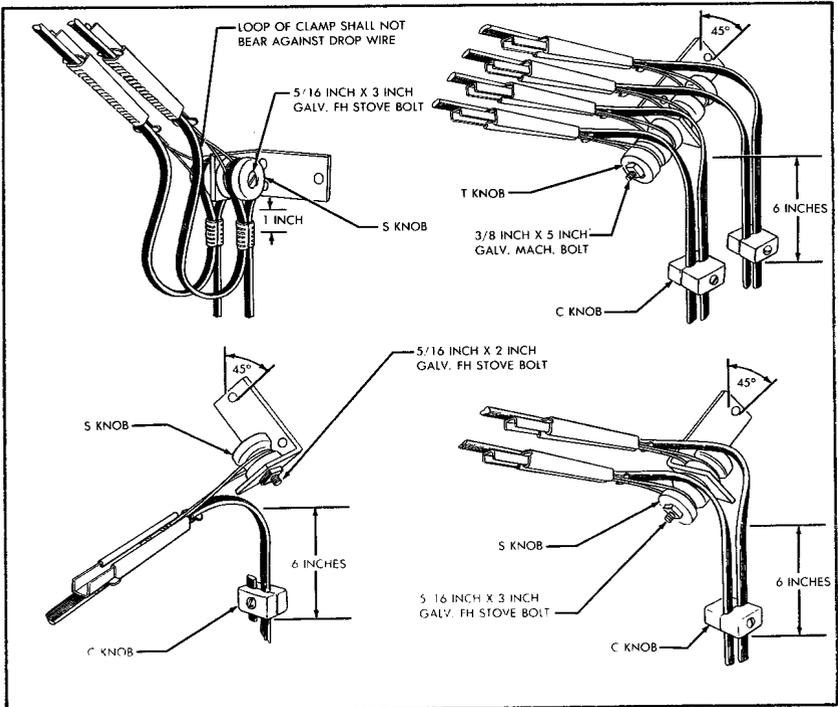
First Attachment, House Bracket (Drop Wire Run in Vertical Direction On Building)
